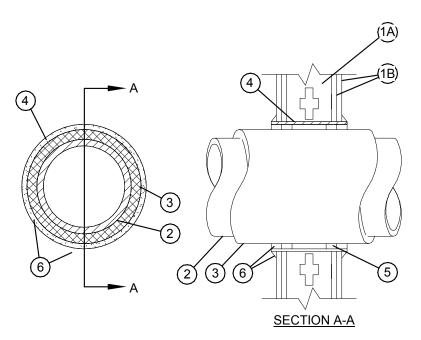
DETAILS SHOWN ON THESE DRAWINGS FOR FIRE-STOPPING OF PENETRATIONS THROUGH RATED WALLS AND FLOORS ARE INTENDED TO REPRESENT GENERAL TYPES OF MATERIALS AND METHODS TO BE EMPLOYED. SPECIFIC REQUIREMENTS VARY ACCORDING TO MANUFACTURER AND ACCORDING TO THE WALL CONSTRUCTION, TYPE AND NUMBER OF CONDUITS, ETC. CONTRACTOR SHALL SUBMIT FOR APPROVAL COMPLETE DATA FOR ALL MATERIALS AND SYSTEMS TO BE USED, ALONG WITH UL-LISTED INSTALLATION DETAIL FOR EACH APPLICATION ENCOUNTERED. ALL INSTALLATION SHALL ADHERE STRICTLY TO AN APPROVED UL-DESIGN DETAIL.
